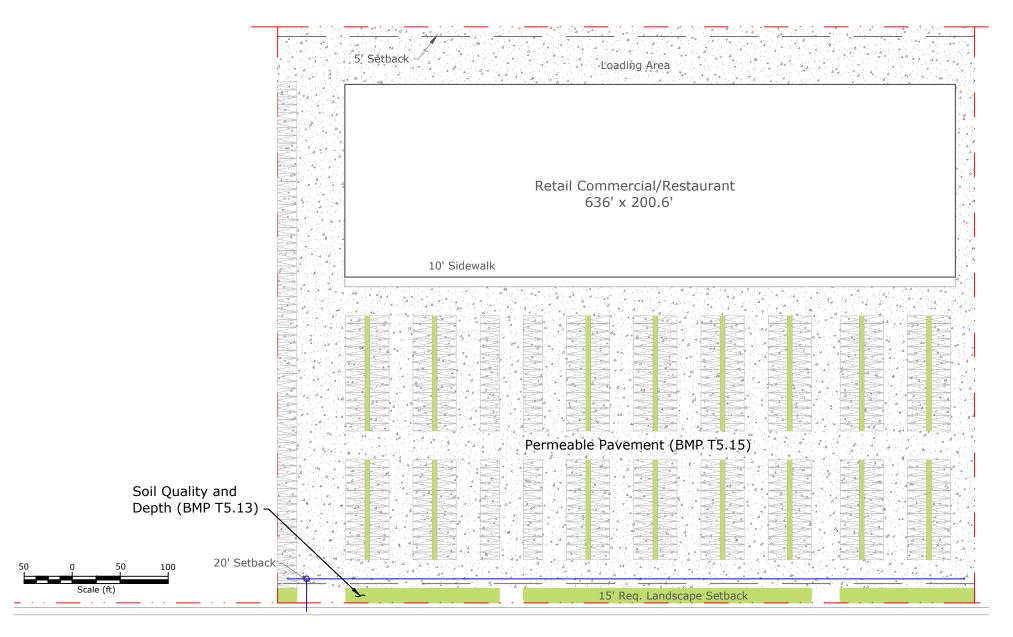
Scenario 14. Permanent Stormwater Site Plan – Large Commercial Development, 2012 Requirements, Till Soils
